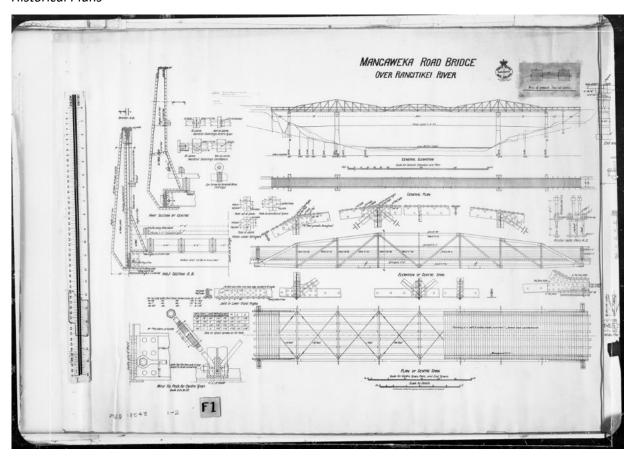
Mangaweka Road Bridge, over Rangitīkei River, No. 1 general plan and elevation plan and details of centre and end spans. E Jackson, Specification 18543, PWD 18543, 1899, Code R25281077, Box 11, Part 1, Archives New Zealand
